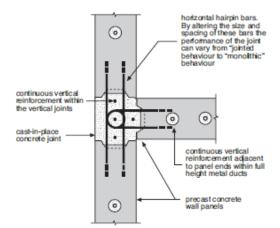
Nearly monolithic precast wall construction vertical joint of the SCT System, Yugoslavia (Reference 4.12)
